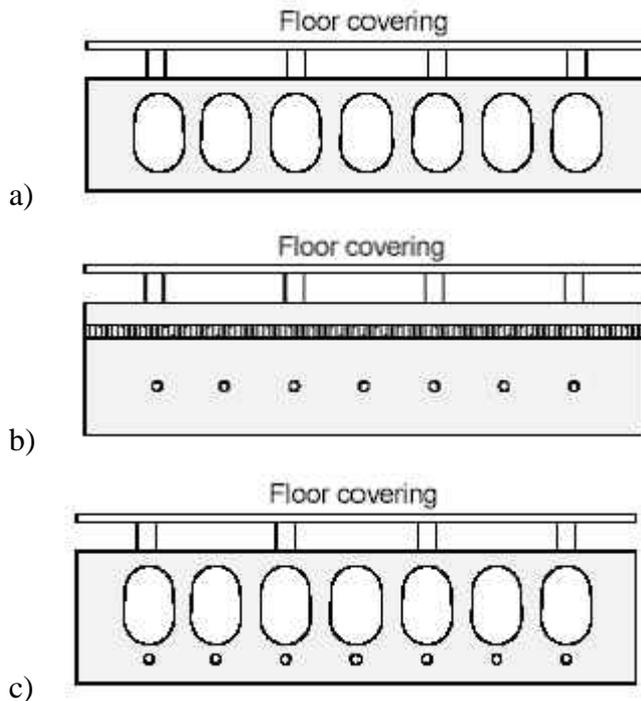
Basic types of currently used thermo active building components (Weitzmann 2002): a) hollow deck with cavities for air circulation; b) on-site constructed floor (with insulation); c) hollow deck with integrated pipes (hollow can be also filled up with polystyrene or other light materials)
